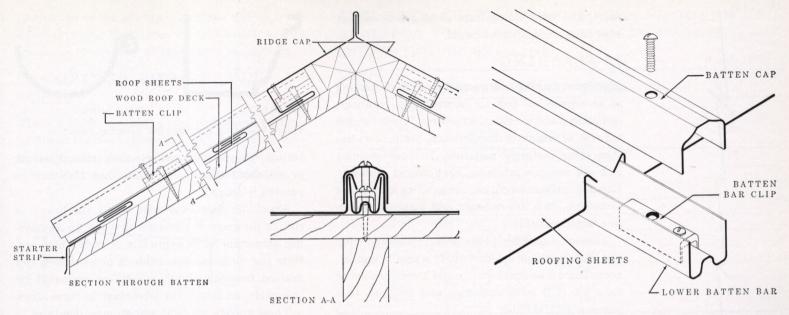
Batten bar installation details for use with pan type aluminum roofing.
